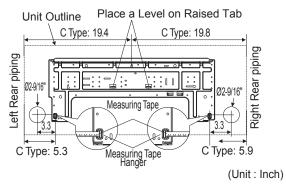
Wall Mount Indoor Unit Installation Plate Dimensions.
